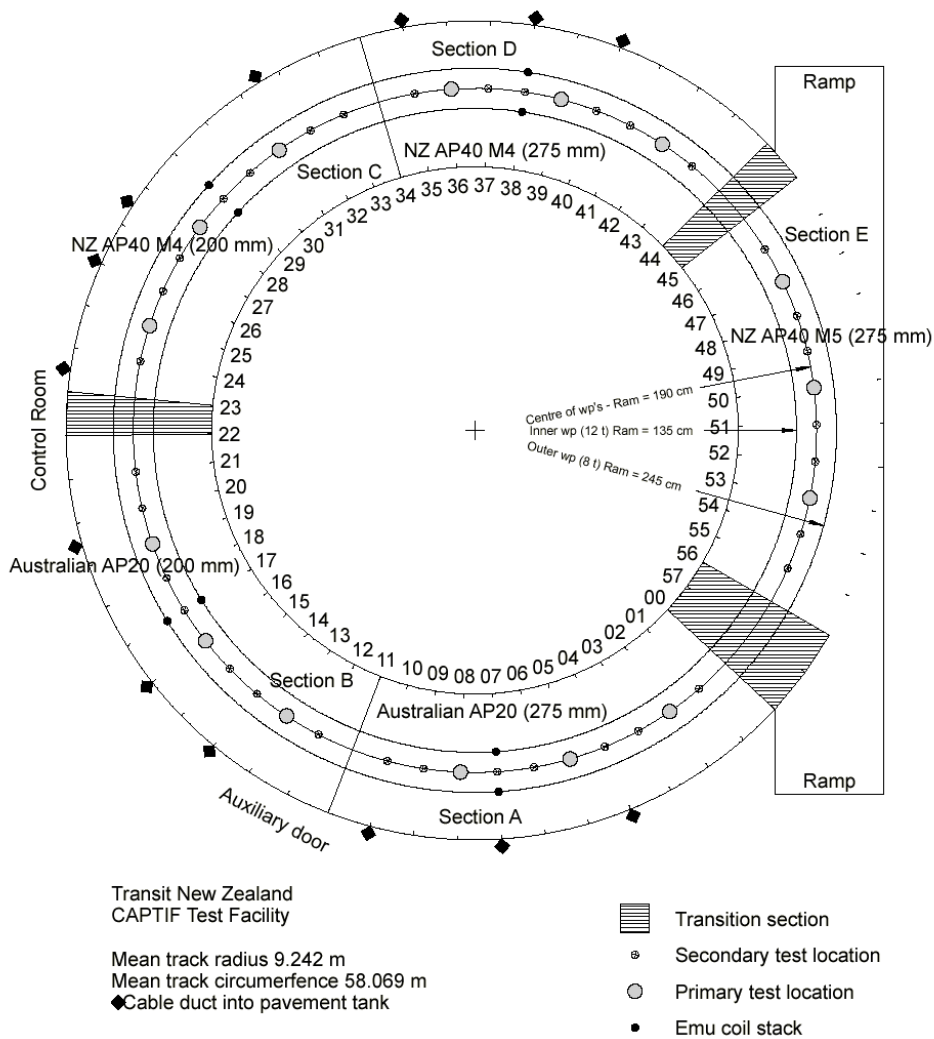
Plan showing the layout of the test segments, and positions of stations.
